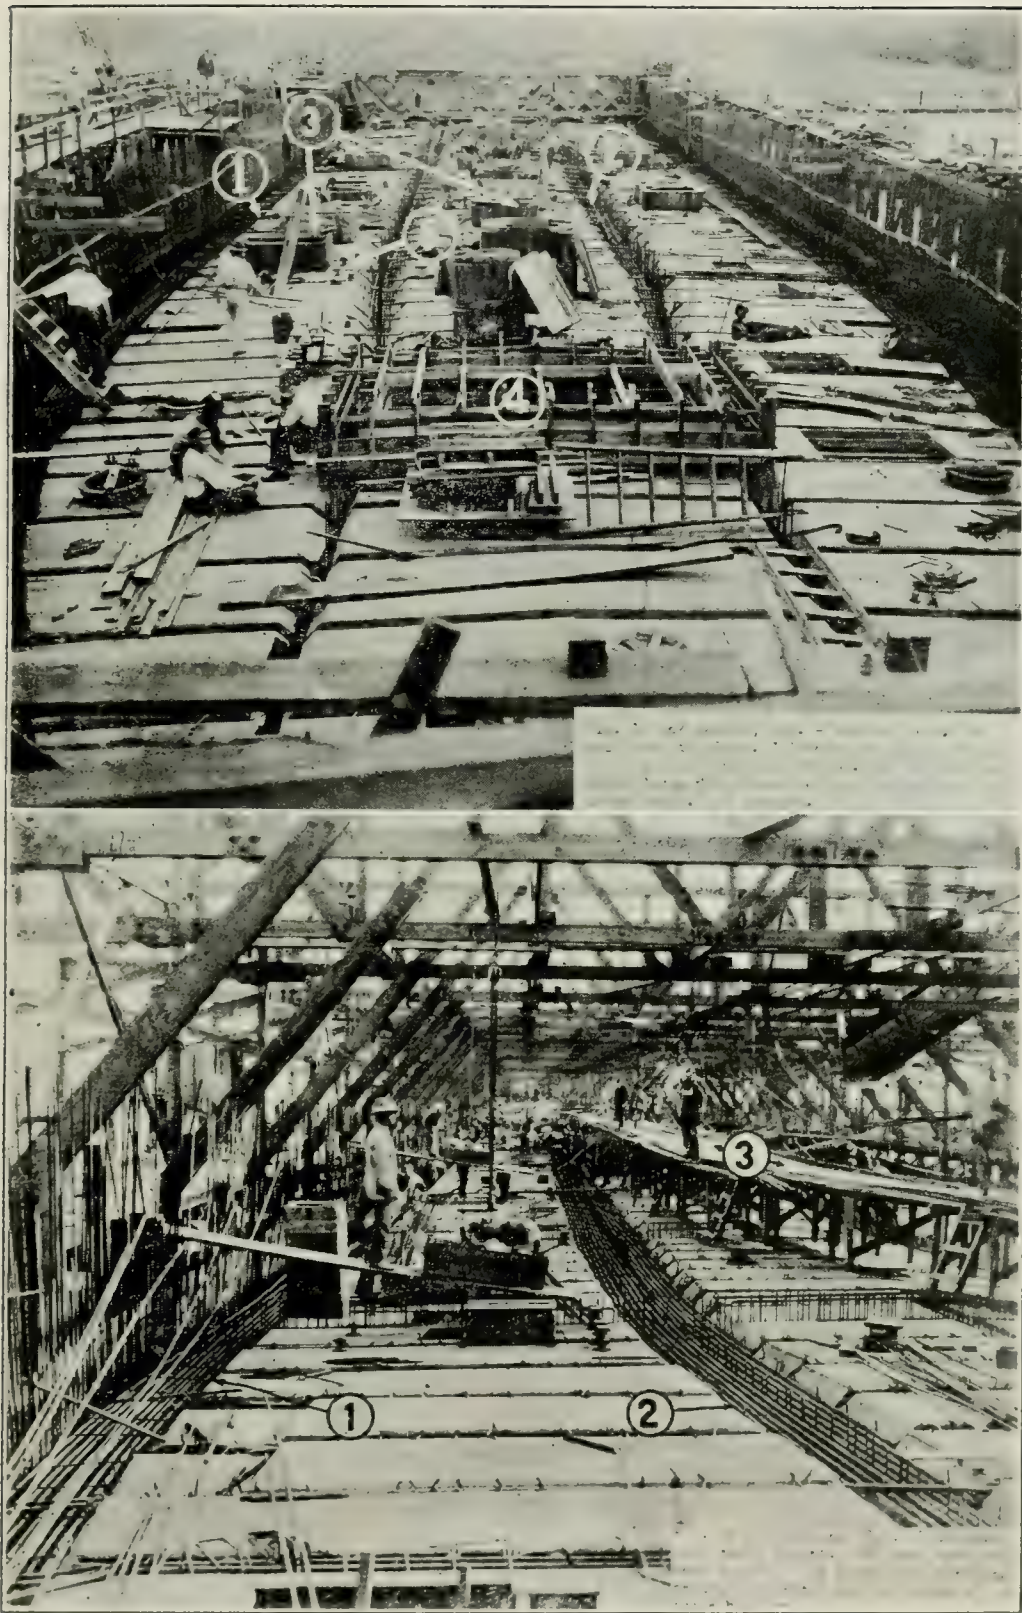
REINFORCING STEEL AND FORMS FOR THE INSIDE FRAMES AND BULKHEADS AND FOR THE TOP DECK BEAMS AND SLABS ERECTED.
